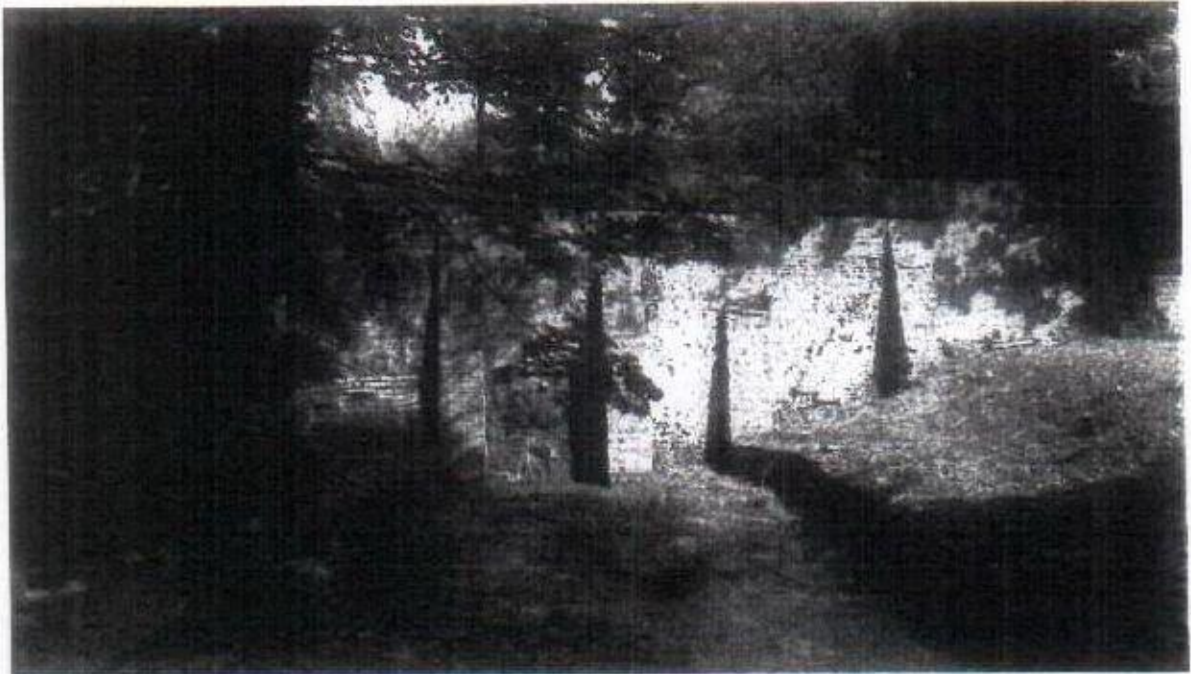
BUTTRESSED GARDEN RETAINED WALL
